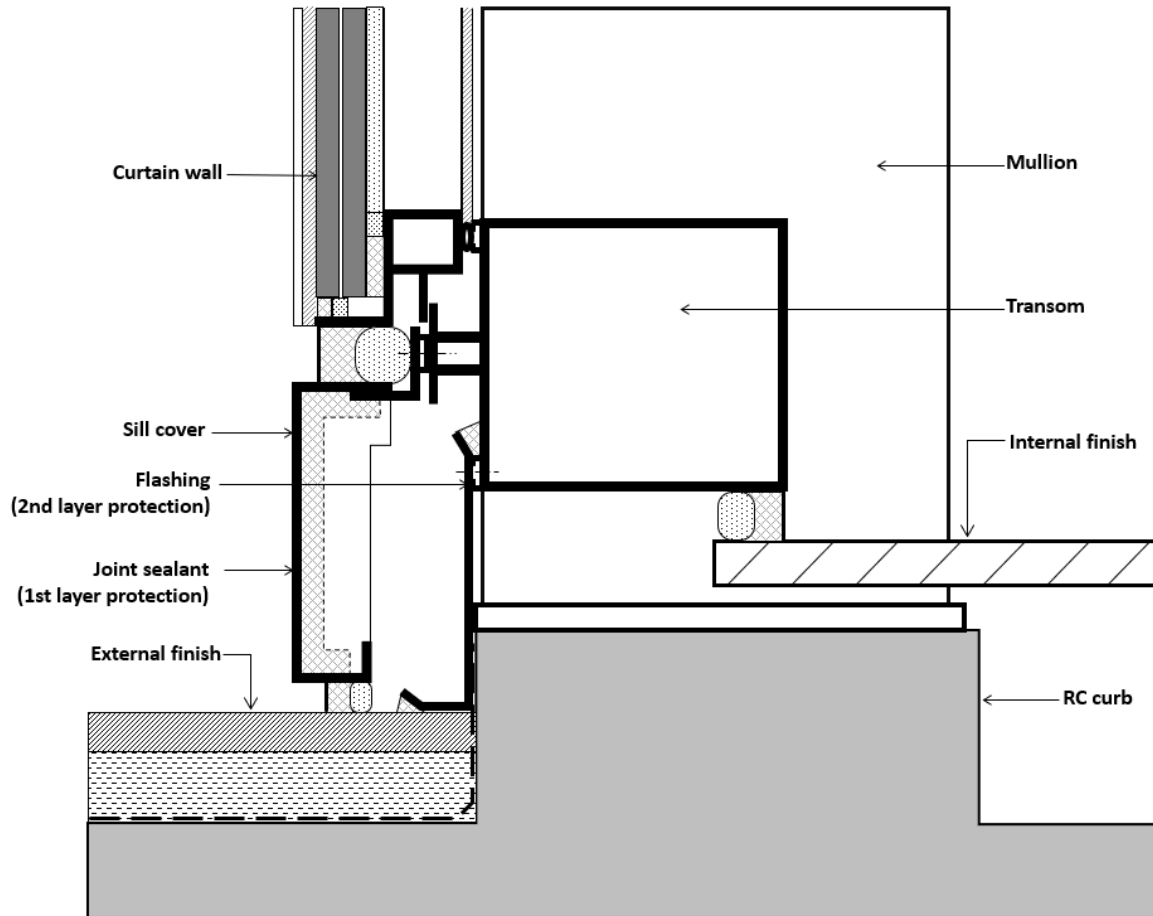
Drawing illustrating double layer protection at bottom flashing, in this case sealant (1st layer of protection) and flashing (2nd layer of protection).
